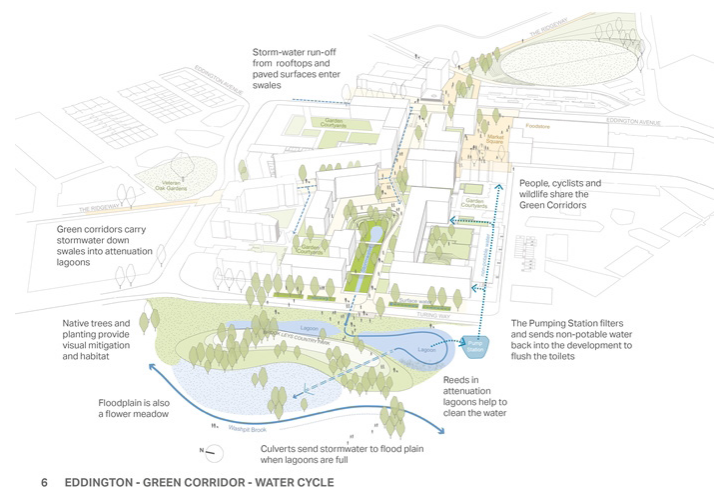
Eddington Master plan EACOM Design and Planning. (2021)
